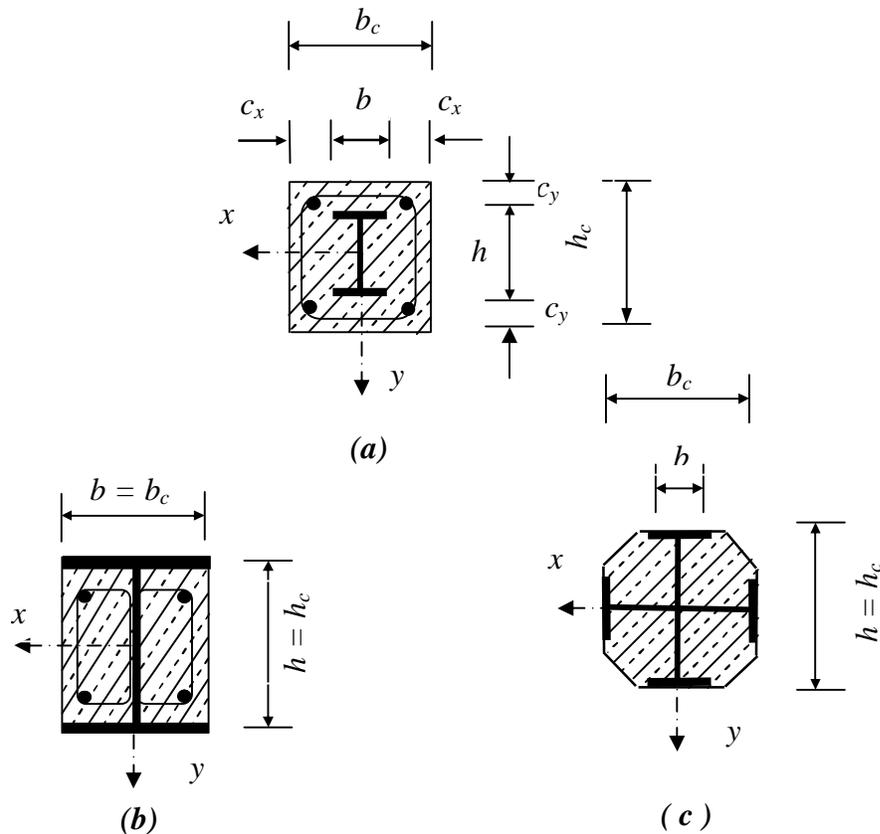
Typical cross - sections of fully and partially concrete encased columns
